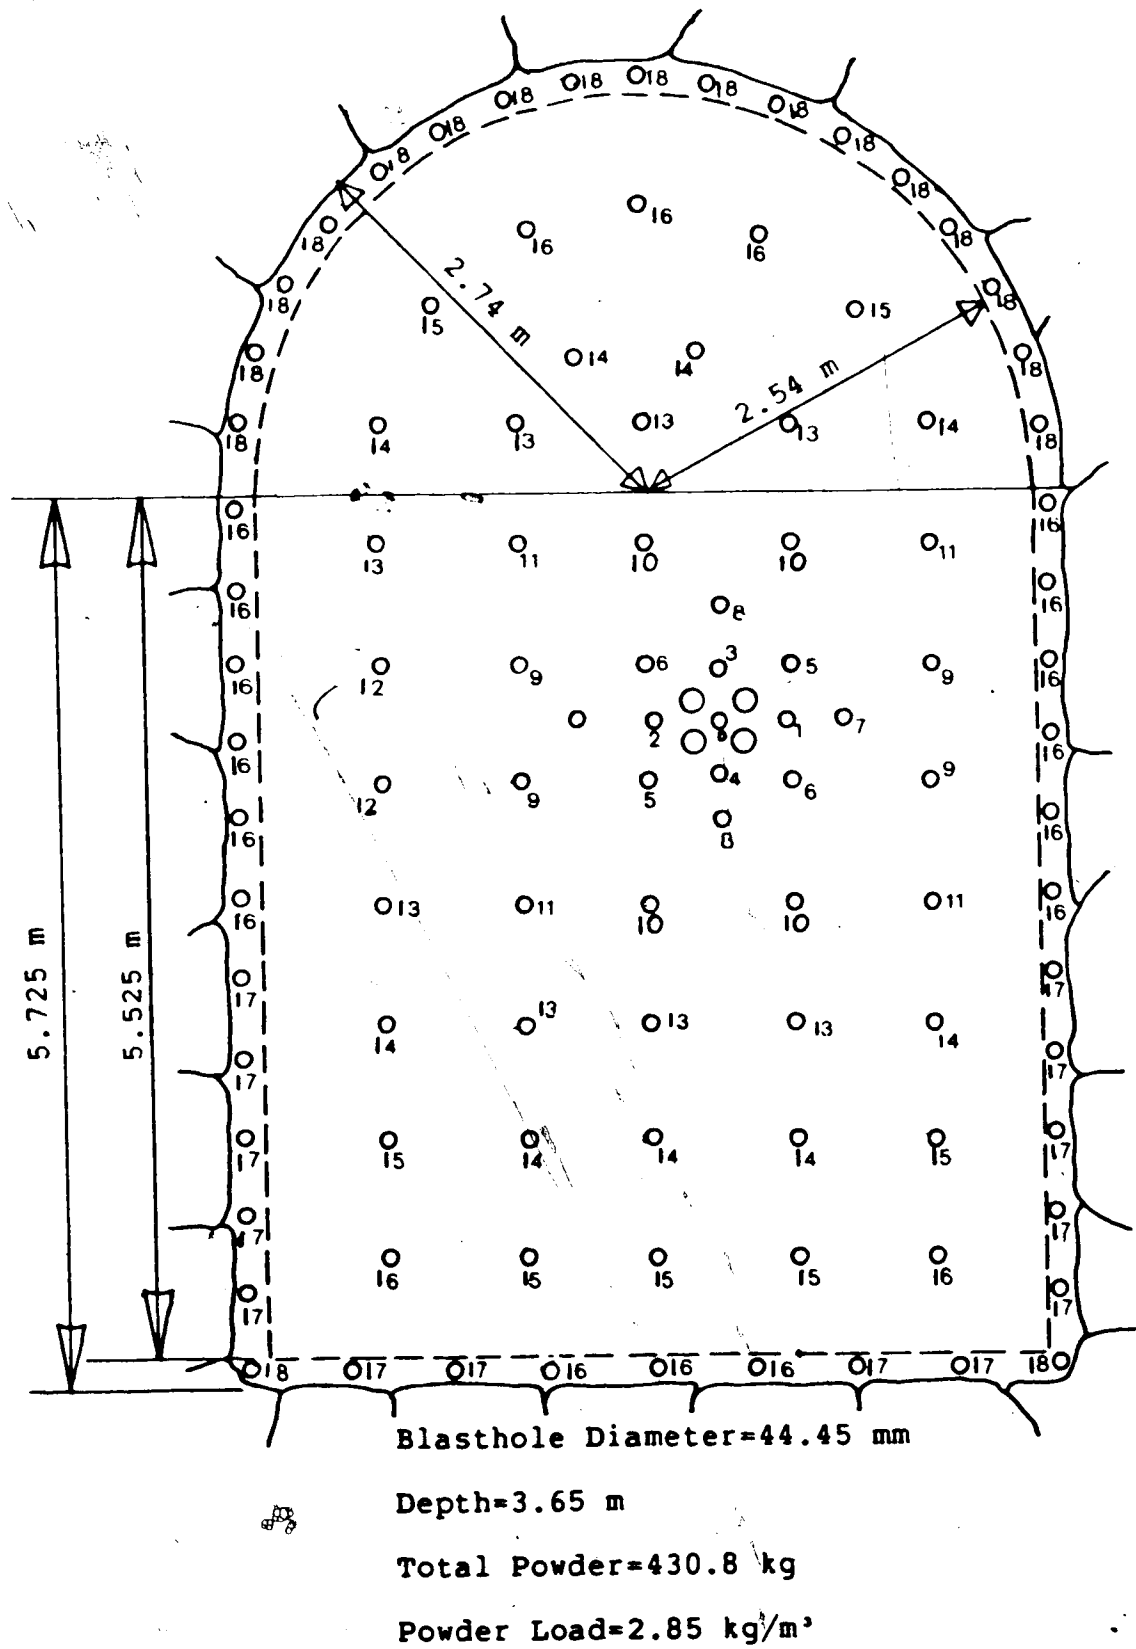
Typical Blast Pattern for Wolverine West Tunnel
